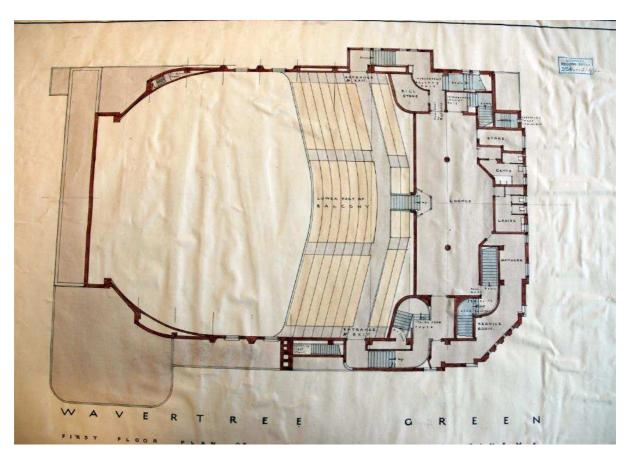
Image of proposed first floor plan dated January 1937 (Source: Liverpool Record Office CE7726)
